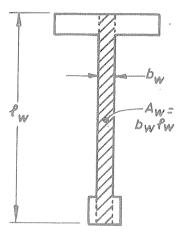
Effective Shear Area of a Flanged Wall Section.
